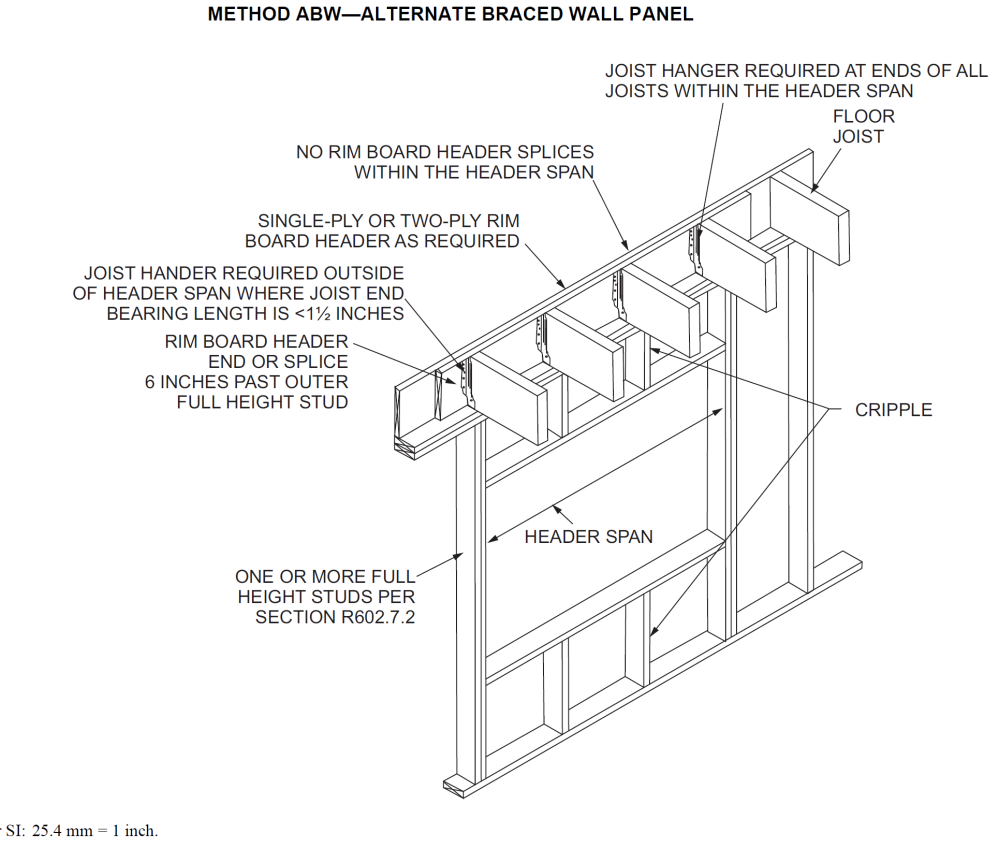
RIM BOARD HEADER CONSTRUCTION
